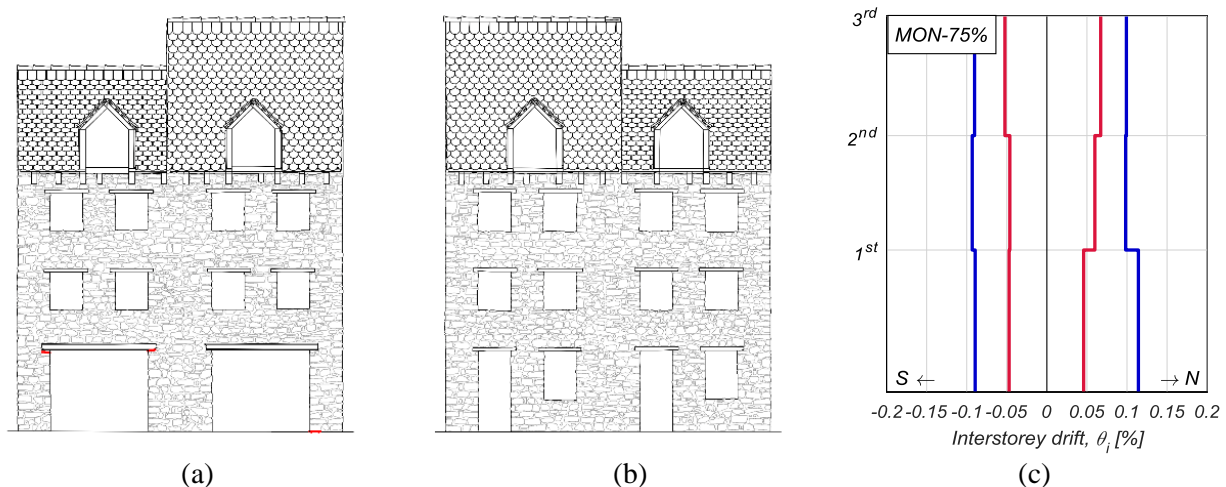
Results after test with PGA of 0.174 g: (a) West wall crack pattern; (b) East wall crack pattern; (c) interstorey drift envelopes, West wall in blue and East wall in red.
